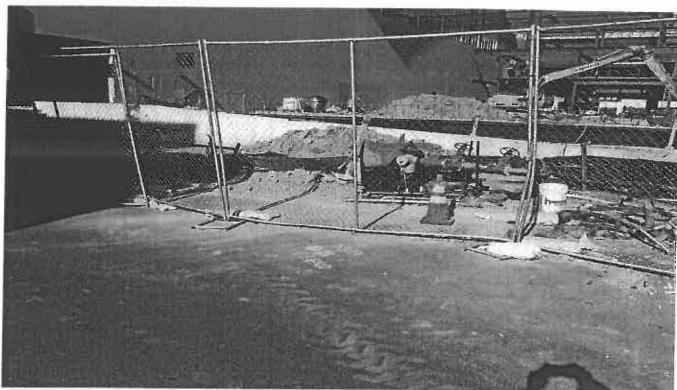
Super Silt Fence overwhelmed with pile of sediment North of the site
